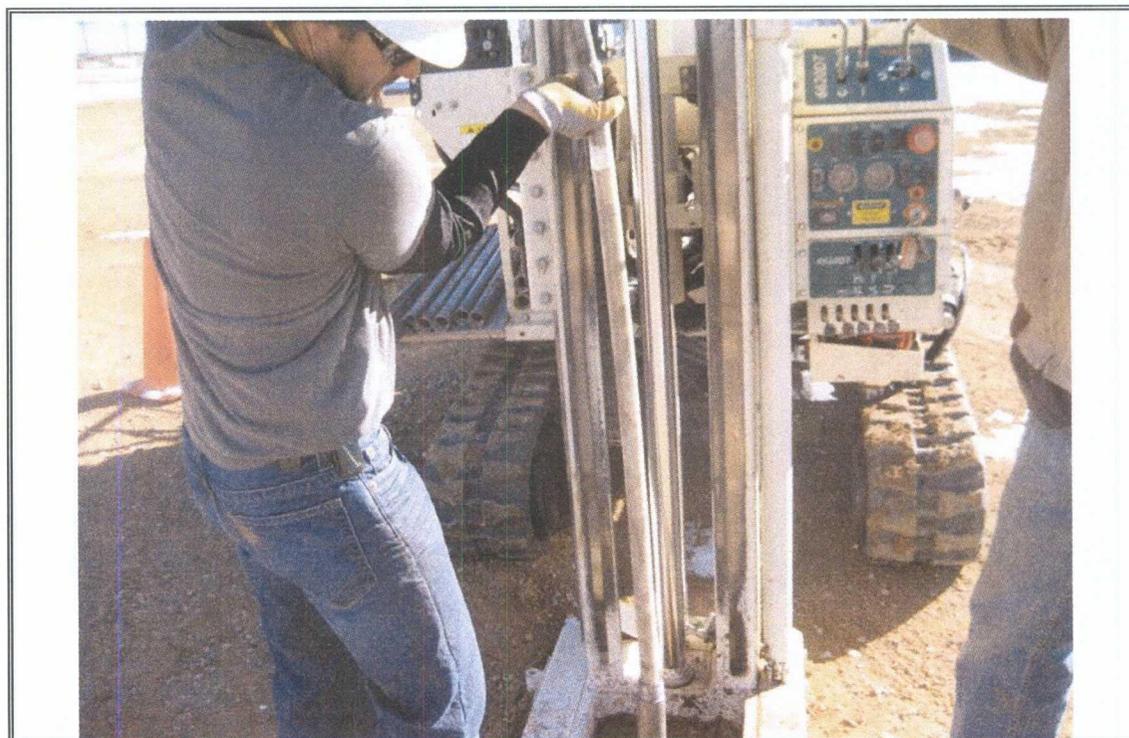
Photograph Number 17: View to the south of geo probe direct push unit performing soil borings.
